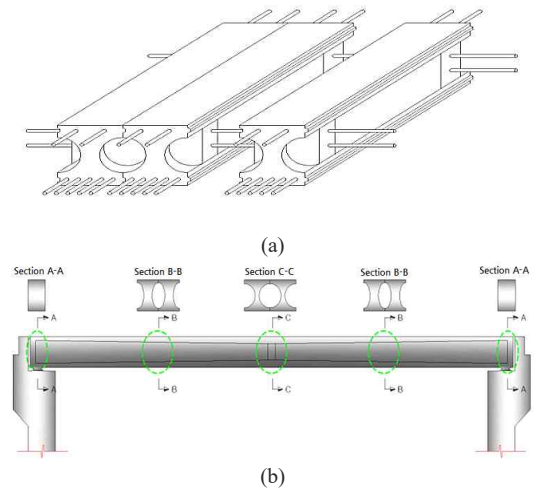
Basic concept of PCB-SLAB girder section (a) Arrangement (b) Applied section
